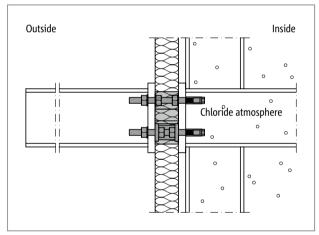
Schöck Isokorb® T Type S with protective caps for cantilevered steel structure in an internal atmosphere containing chloride
